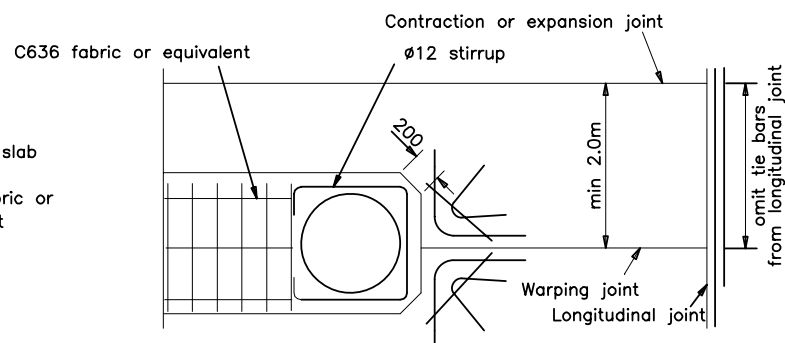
EXTRA JOINT AT MANHOLE POSITION TO BE A WARPING JOINT
